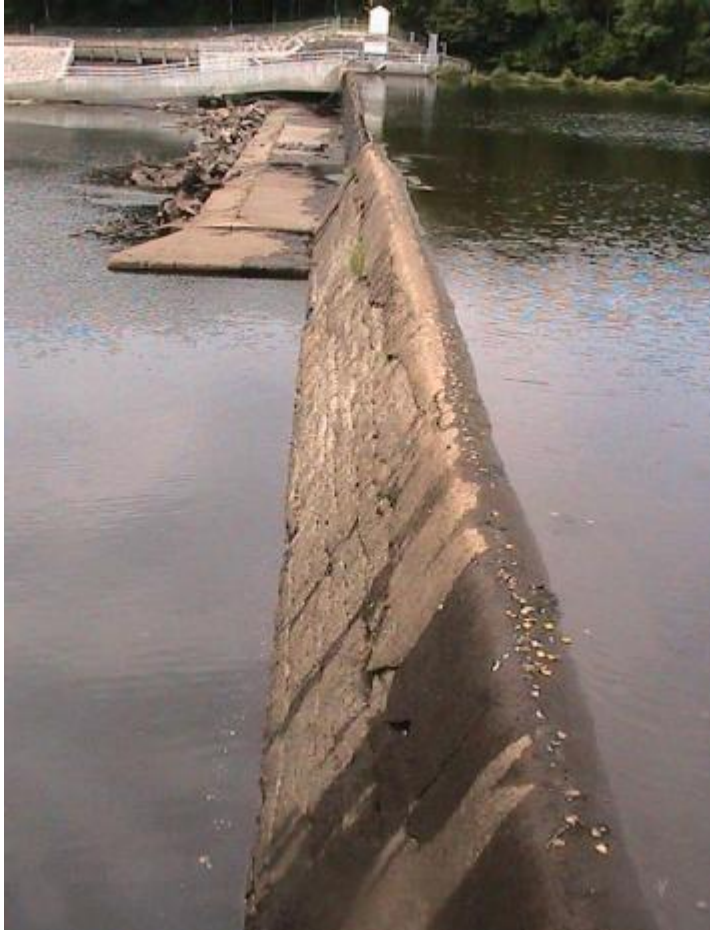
Occum dam, concrete spillway in foreground, then masonry spillway and forebay area.
